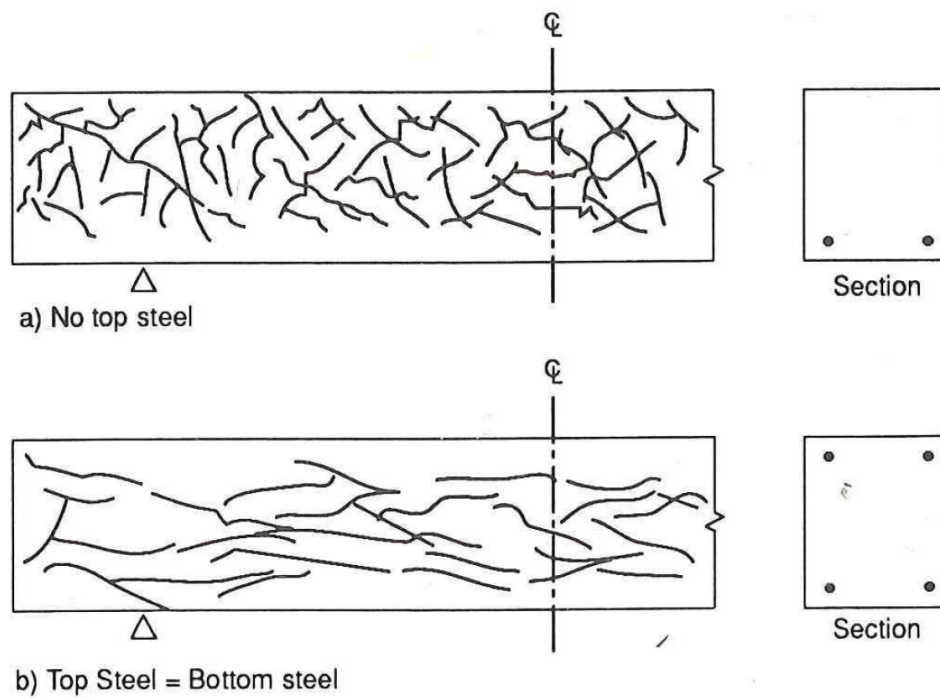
Influence of reinforcement on ASR cracking, adopted from [ISE \(1992\)](#)
